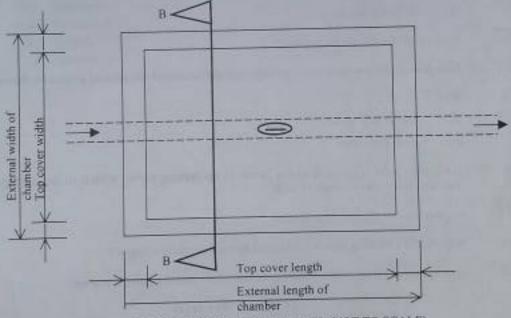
PLAN OF INSPECTION CHAMBER (NOT TO SCALE)
